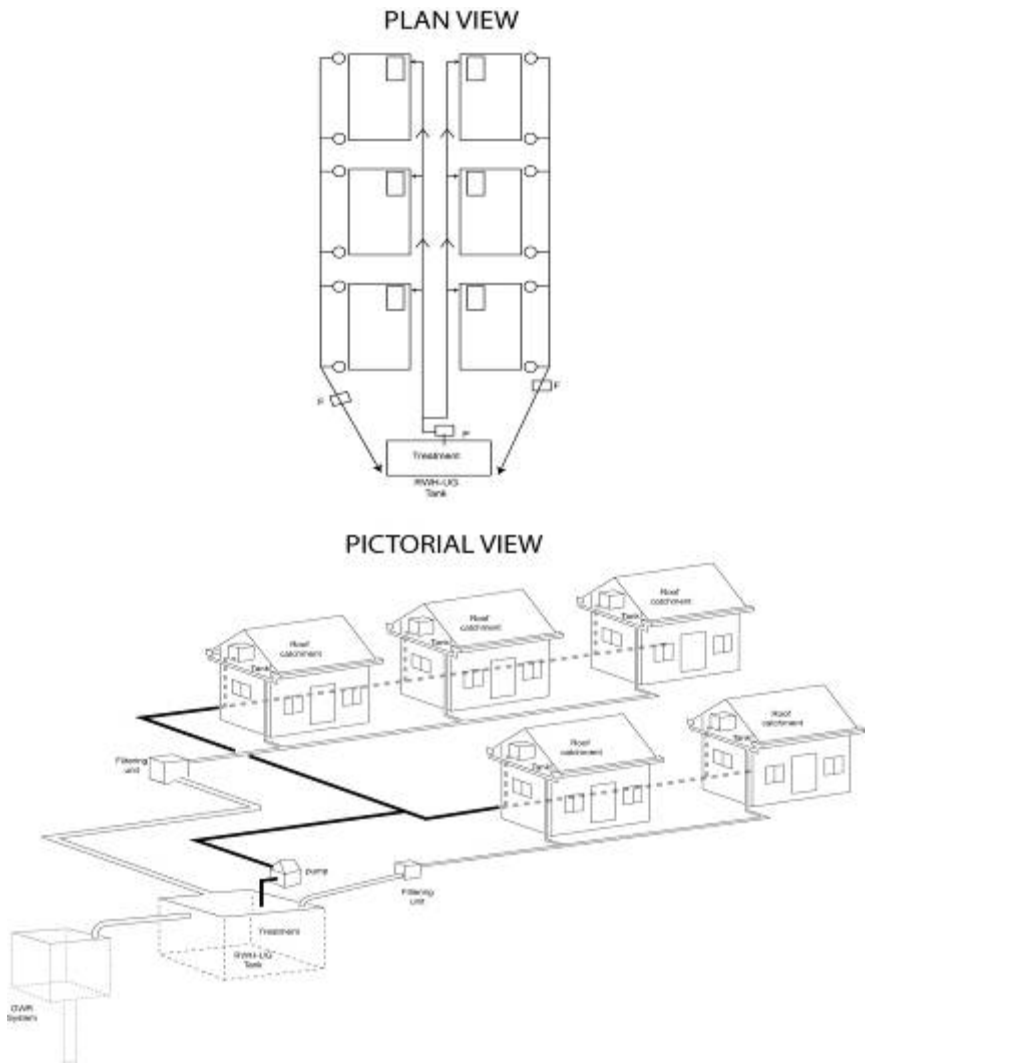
Plan and pictorial view of an estate storage and groundwater recharge facility
